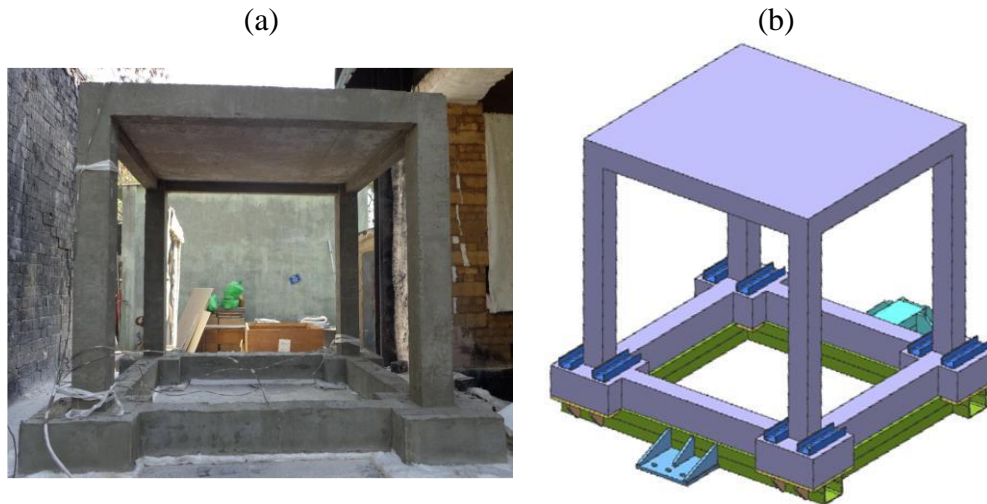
(a) RC frame before testing and (b) fixing of the base of the frame (Parmar et al., 2014).
